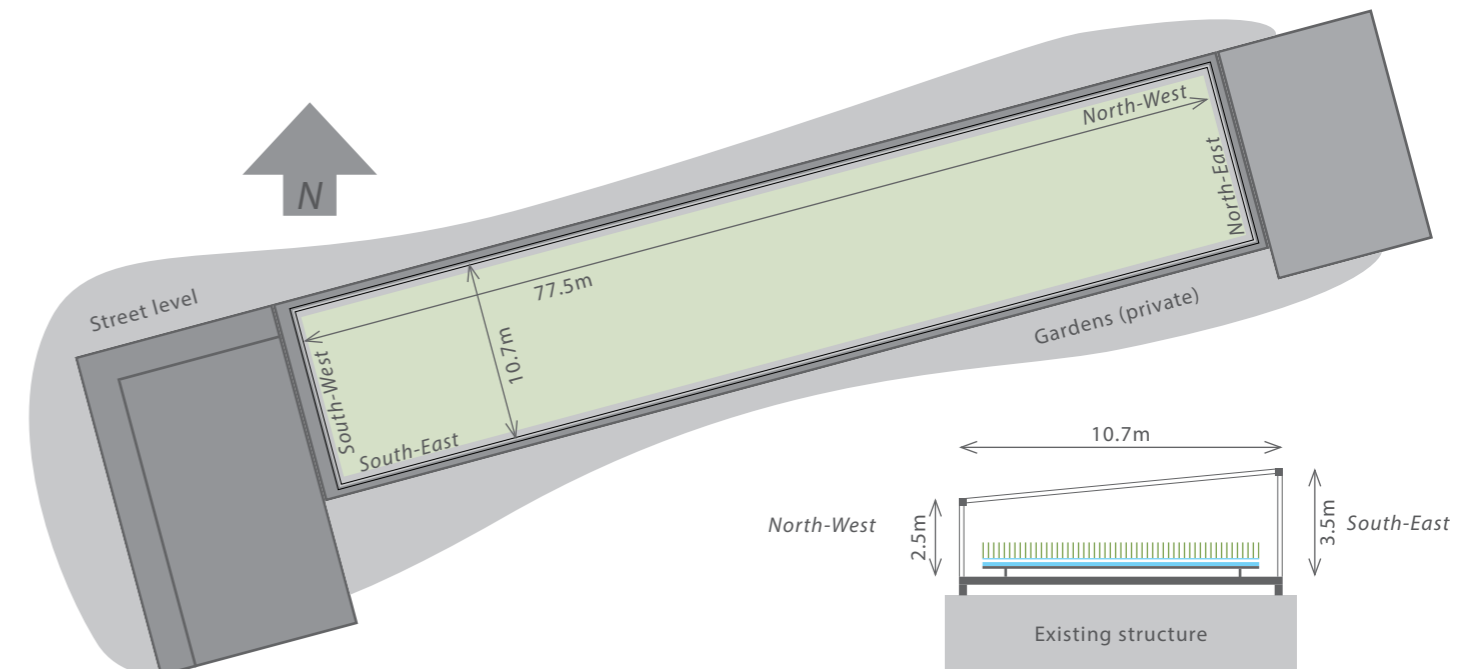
Sketch of greenhouse A (greenhouse B is similar). Calculations are based on this layout
